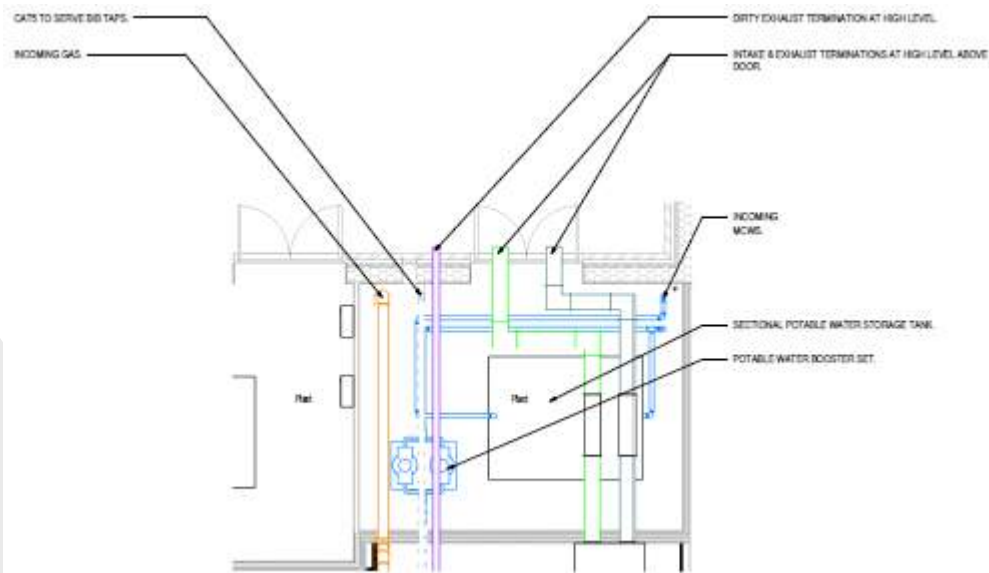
Ground Floor (20.9m<sup>2</sup>) Plantroom Layout – Turing House School
